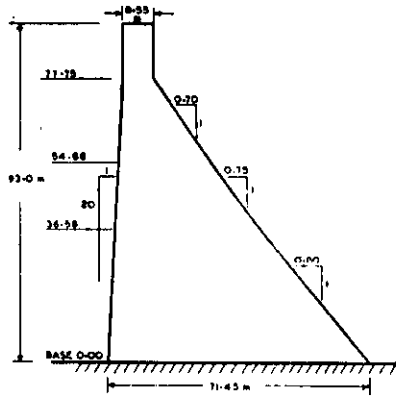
CROSS-SECTION OF SHOLAYAR DAM
